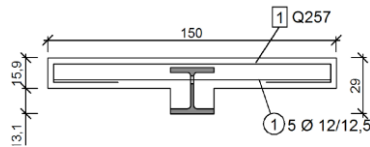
Reinforcement mesh [Stu2011] 5.4.2.10: Concrete tension damage - longitudinal crack
